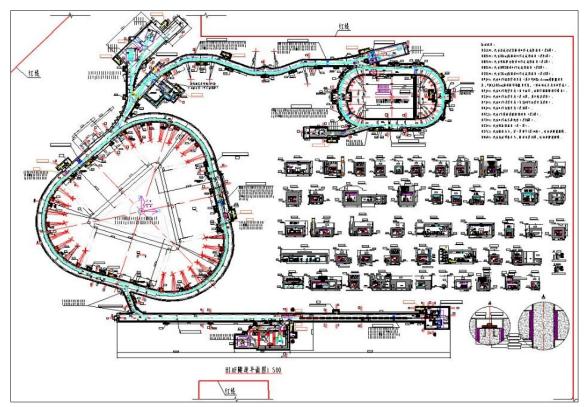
Schematic Layout of the accelerator complex and its tunnel
